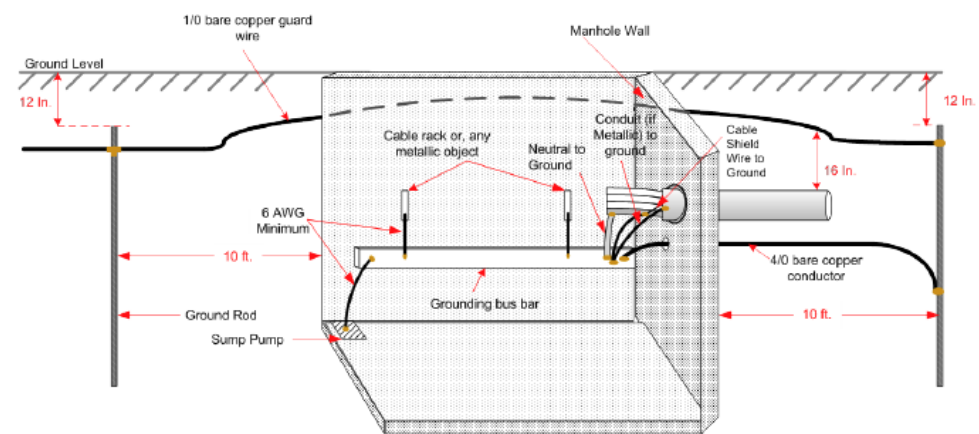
Grounding and guard wire installation detail at a manhole.
